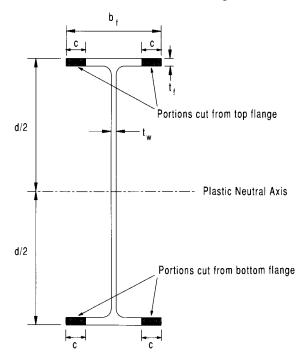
Cross-Section of RBS with Top and Bottom Flange Cutouts
